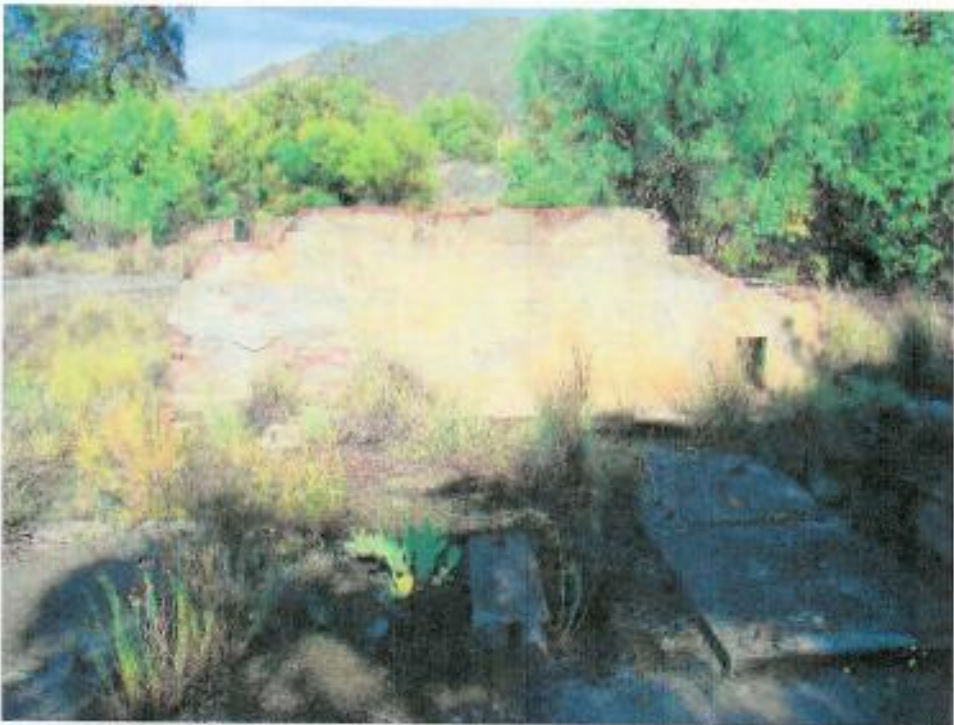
Detail of above-ground structures at Washing Plant (1)
